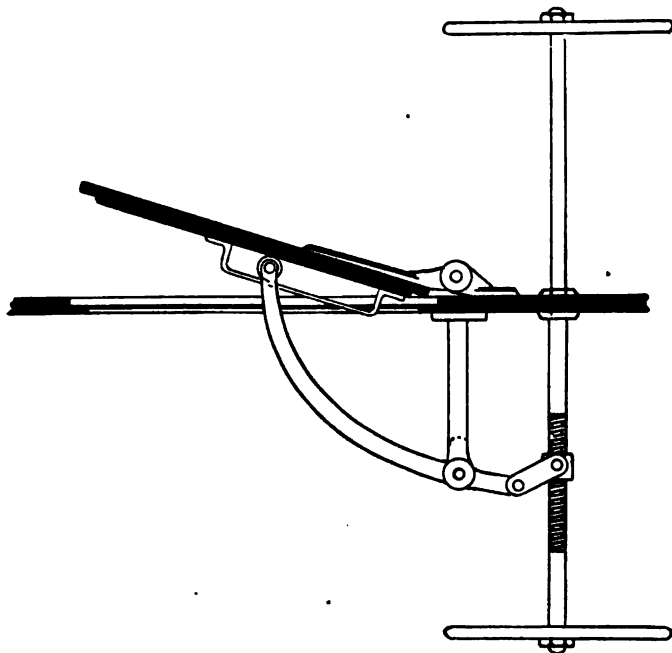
SKETCH OF HATCH OPERATED BY SCREW GEAR.
